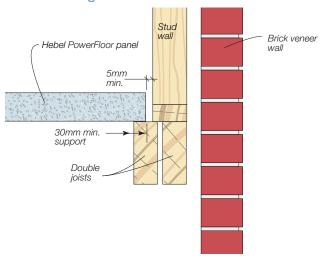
Platform Flooring with External Loadbearing Wall
